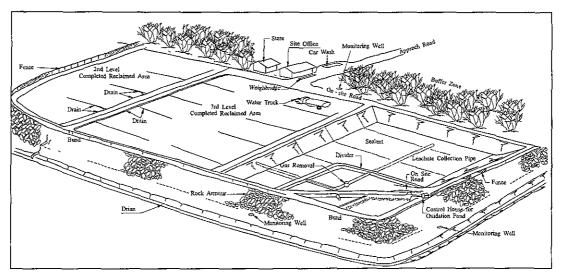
(c) Typical Layout for the Level 4 Sanitary Landfill
